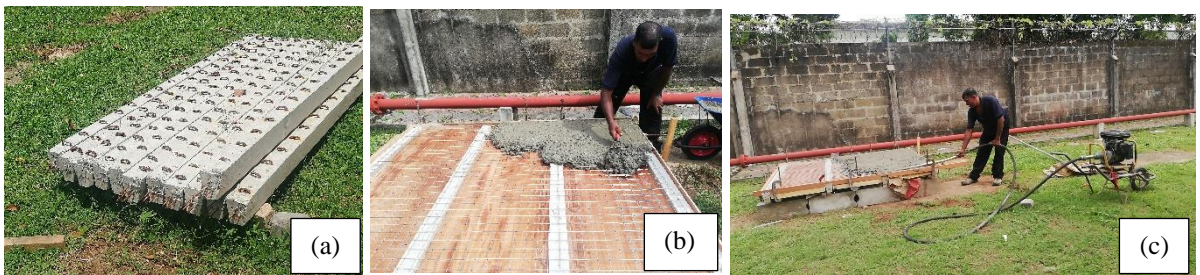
Sample preparation (a) pre-stressed beams with shear links (b) Hanging formwork and placing concrete (b) applying poker vibrator.
